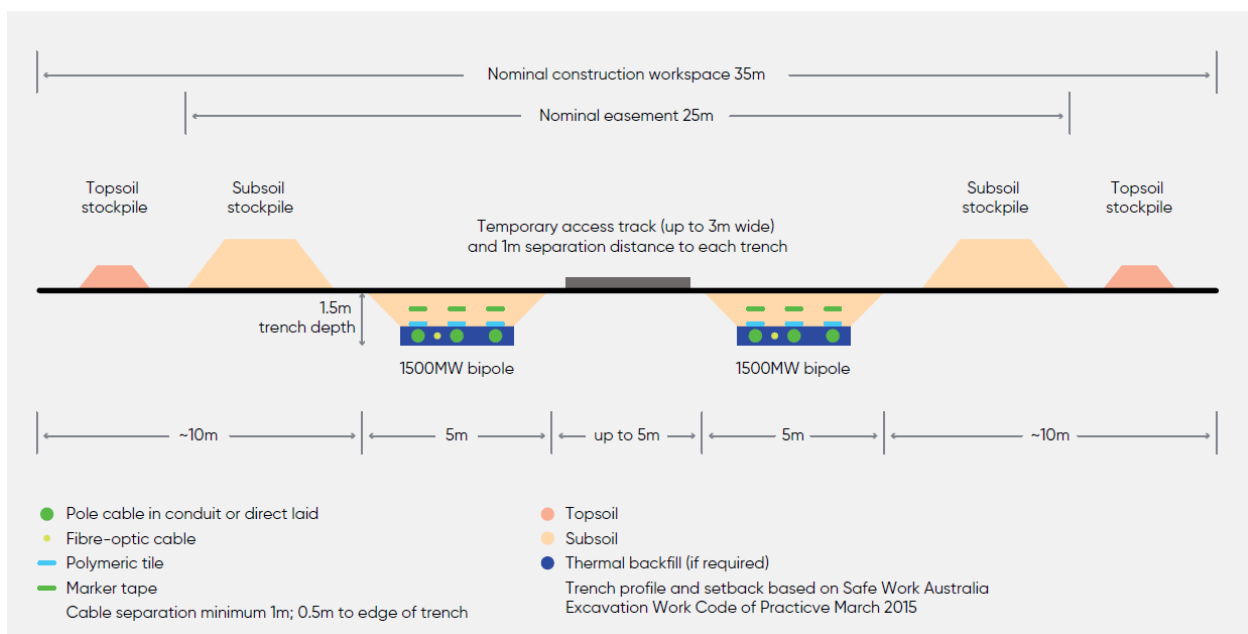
Typical arrangement of HVDC twin bipole construction corridor and easement
